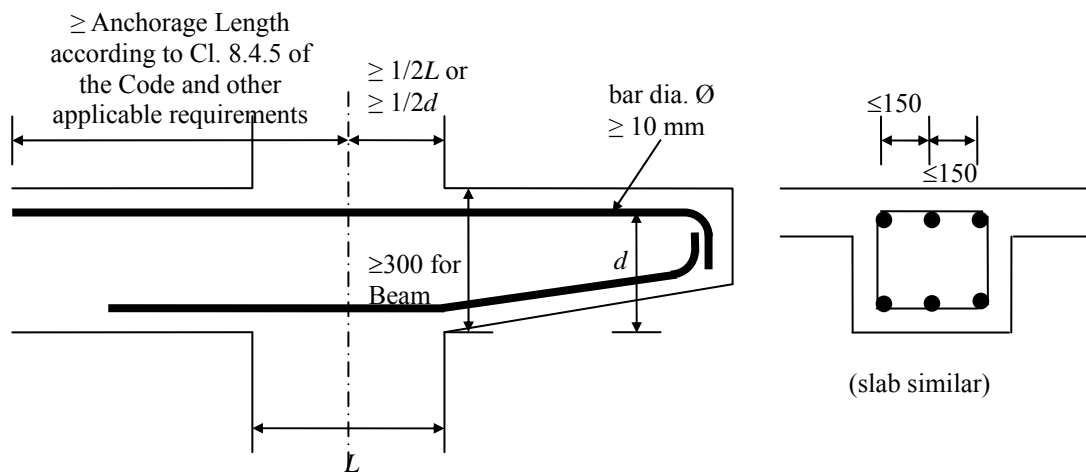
Detailing Requirements of Cantilever Projecting Structure Supported on Members Providing Rotational Restraint
